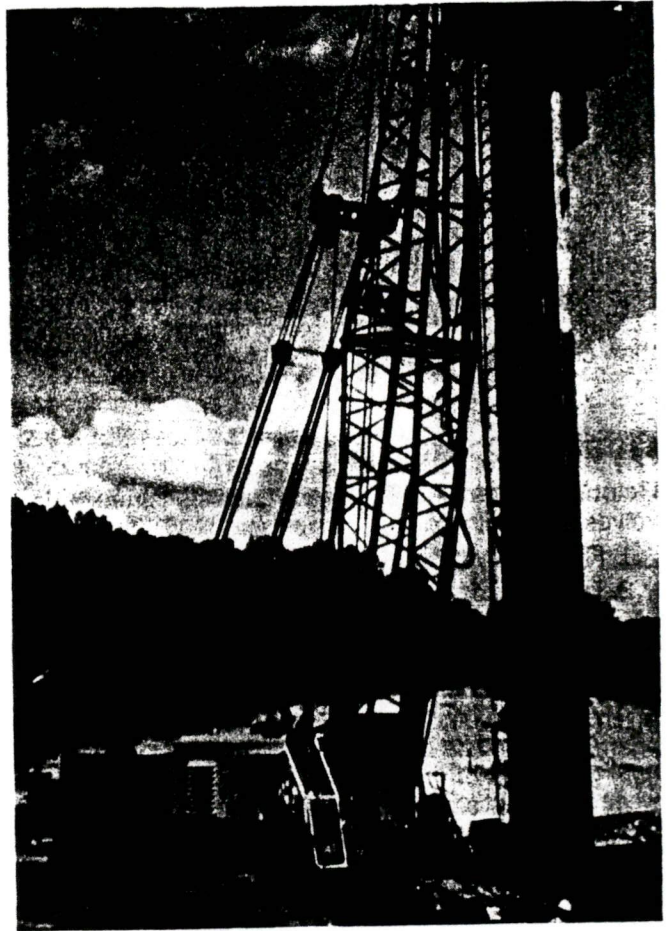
Vibrating beam technique for installation of cement-bentonite slurry wall. (Courtesy of Slurry Systems, Inc., Gary, Ind.)
